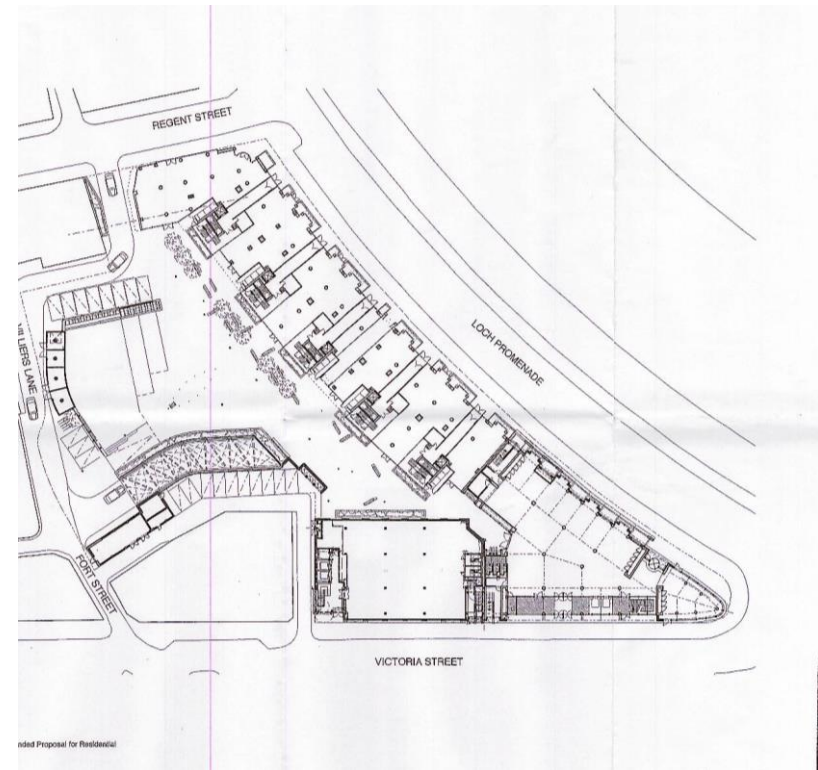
amended 2004 planning application for residential use on the Loch Promenade site.
